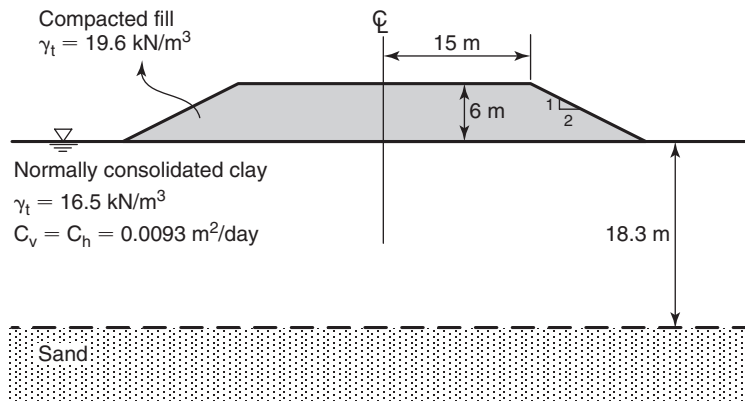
Highway embankment for prefabricated vertical drain problem.
